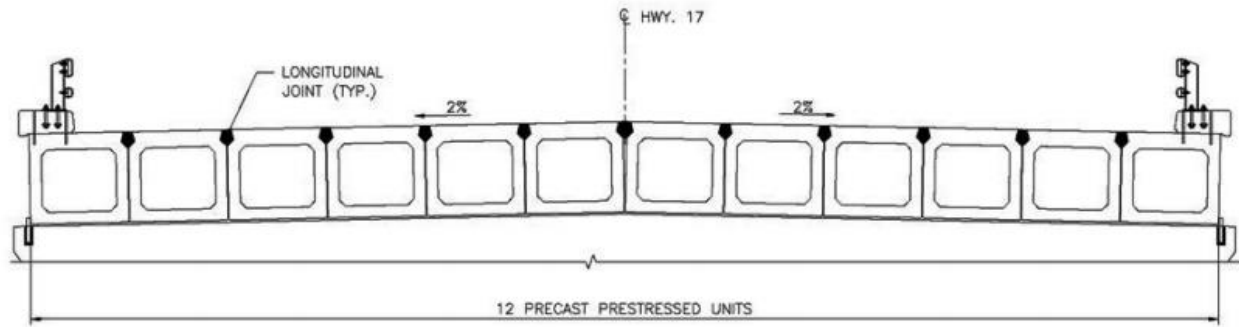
Cross-section of bridge superstructure. Rajlic et al. (2010).
